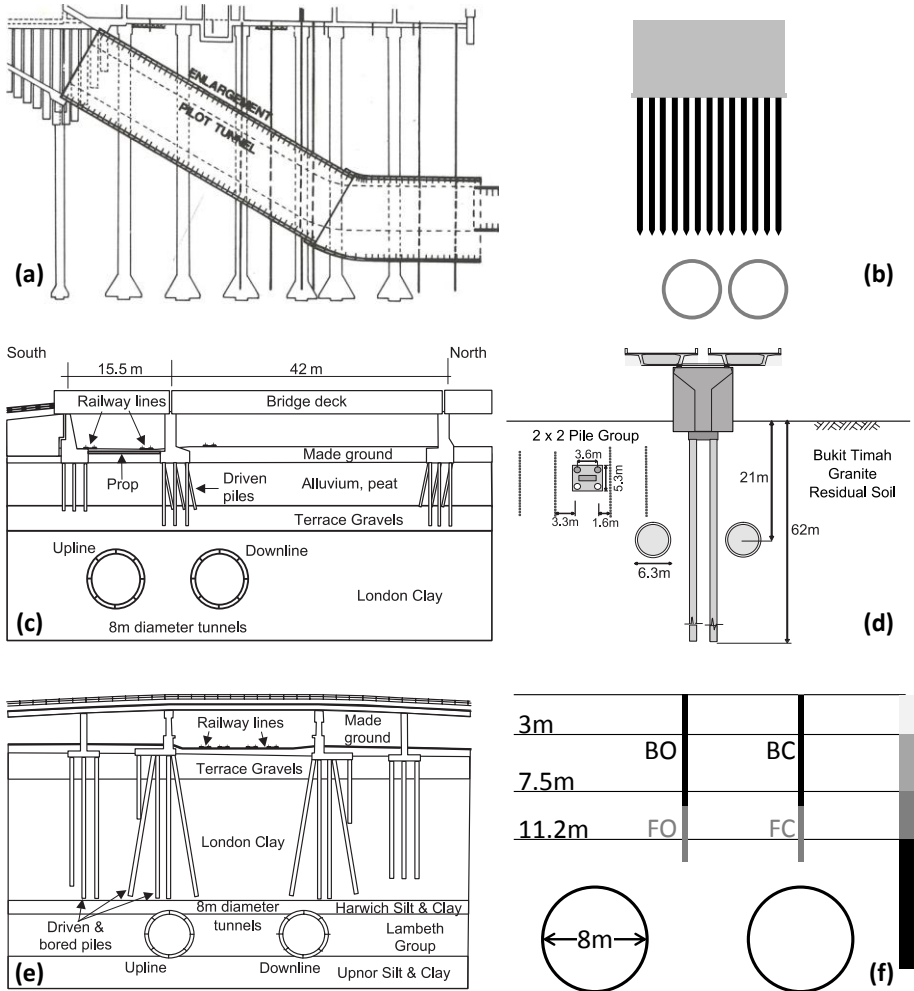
Examples of case studies and full-scale tests: (a) Angel Station escalator tunnel, U.K.; (b) Higashi-Shinagawa roadway bridge, Japan; (c) Renwick Road Bridge, UK; (d) MRT North East Line viaduct bridge, Singapore; (e) Ripple road flyover, U.K.; (f) full-scale test on the Channel Tunnel Rail Link, UK.
